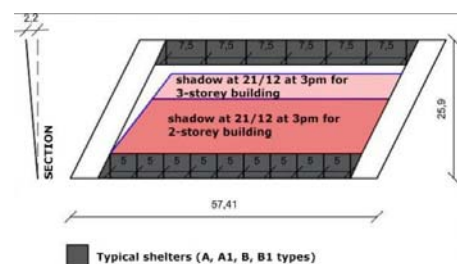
Typical plan of the neighborhood— Shadow at 21/12 at 3pm
